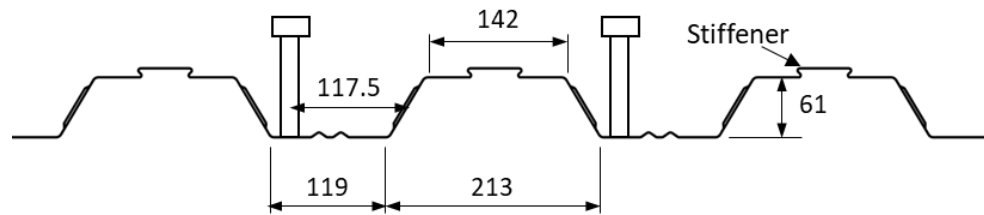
Dimensions of trapezoidal deck (Multideck 60-V2)
